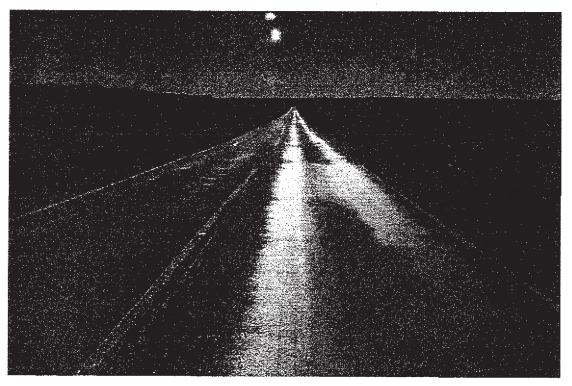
MP 14.5 - Typical Pavement Section, Looking Back
